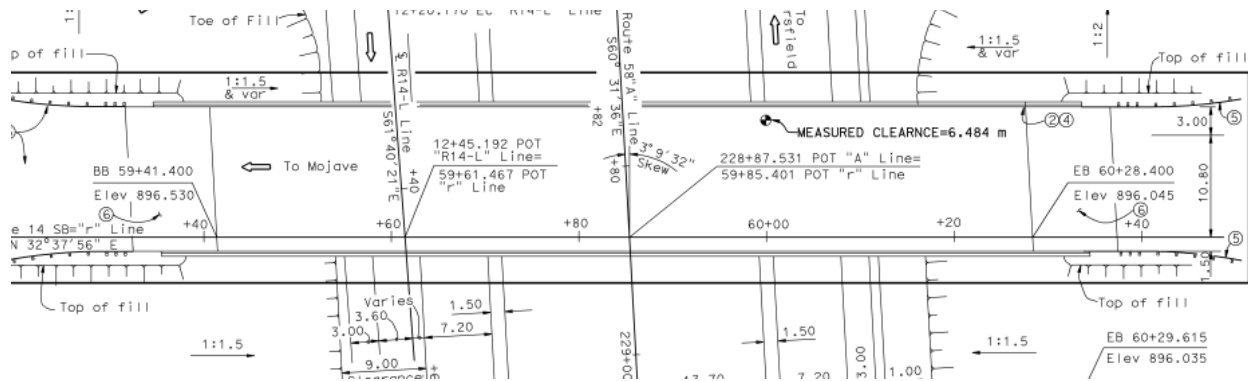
Schematic Plan view of R14L bridge (drawing provided by Caltrans)
